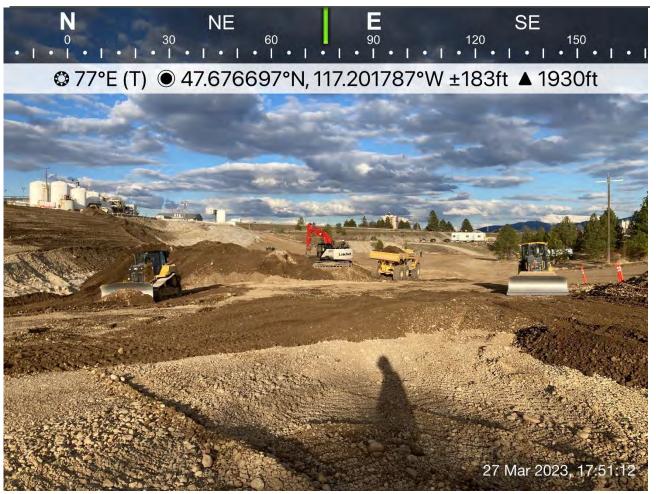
LinkBelt trackhoe loading the off-road haul truck with excavated materials to be dumped on the UPRR slope. The John Deere 700L dozer pushed excavated material toward the LinkBelt trackhoe to aid in the transfer efforts.
